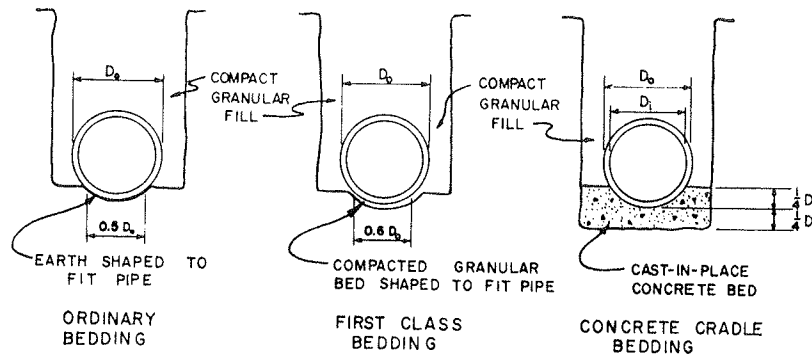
Bedding classes for culvert pipe. The foundation for pipe culverts should *always* be shaped to fit the pipe. Most culverts are placed with ordinary bedding. Extra strength is provided by first class and concrete cradle bedding. (Concrete cradle should not be used with flexible pipe such as corrugated metal).
